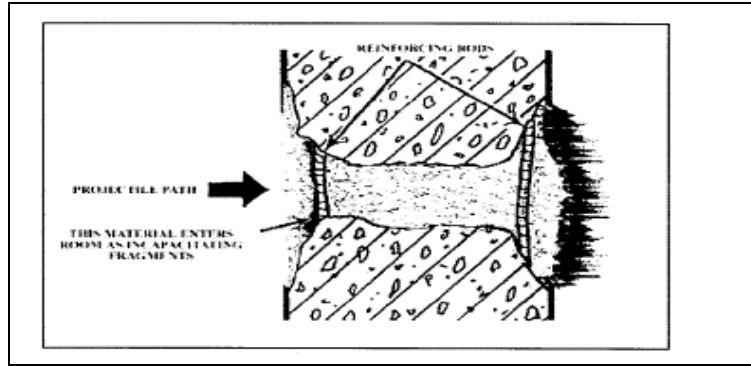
Tank HEAT Round Effects on Reinforced Concrete Walls
